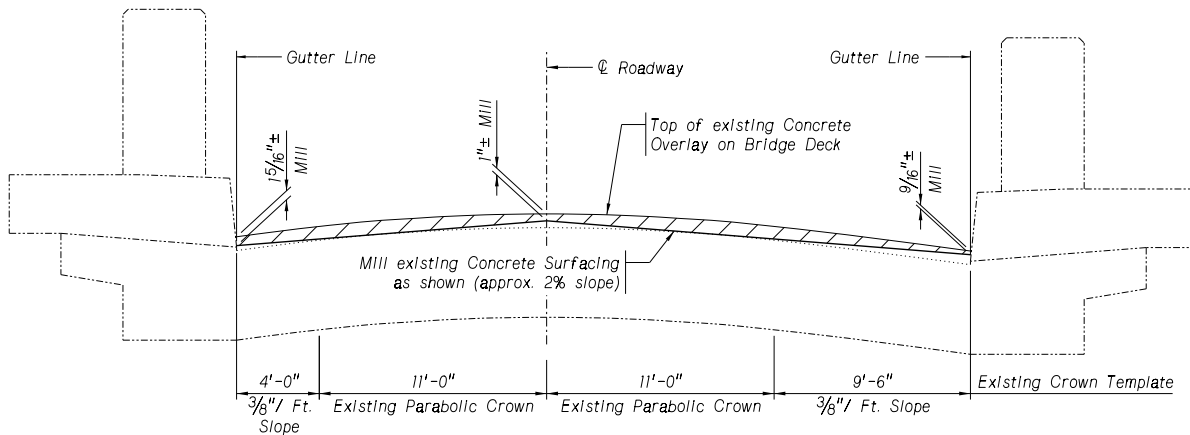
Milling of Existing Concrete Overlay for Parabolic Bridge Decks (example taken from S080 32744R, CN 42888, 2020)
